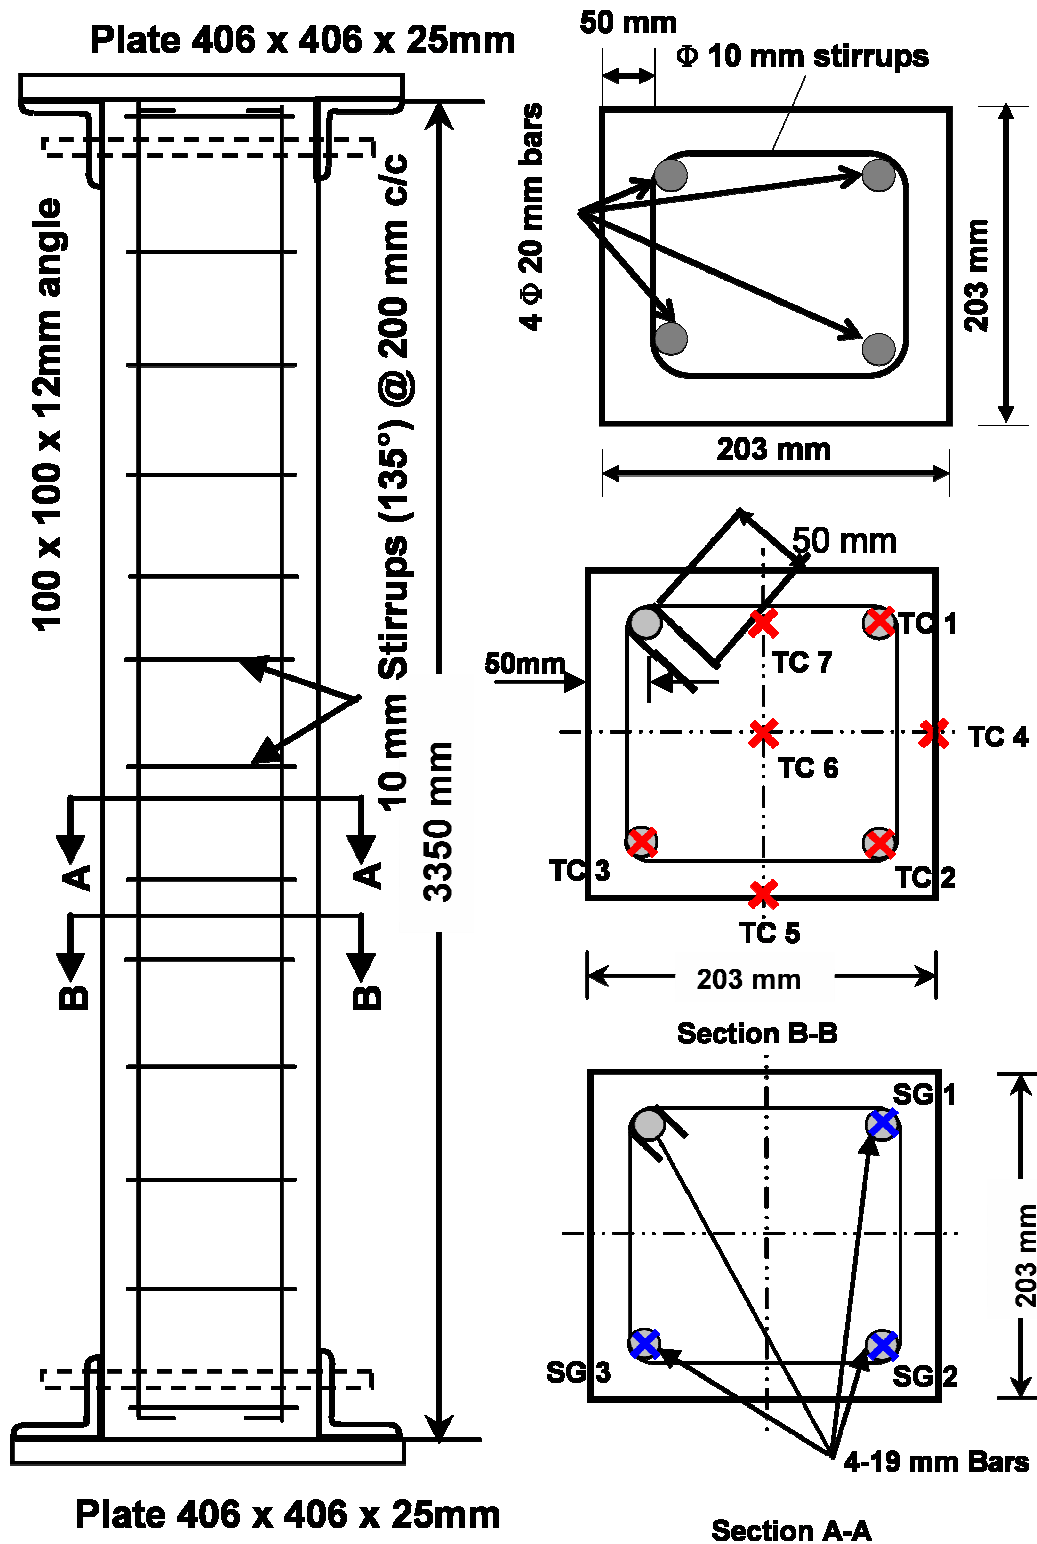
Column dimensions and locations of thermocouple and strain gauges
